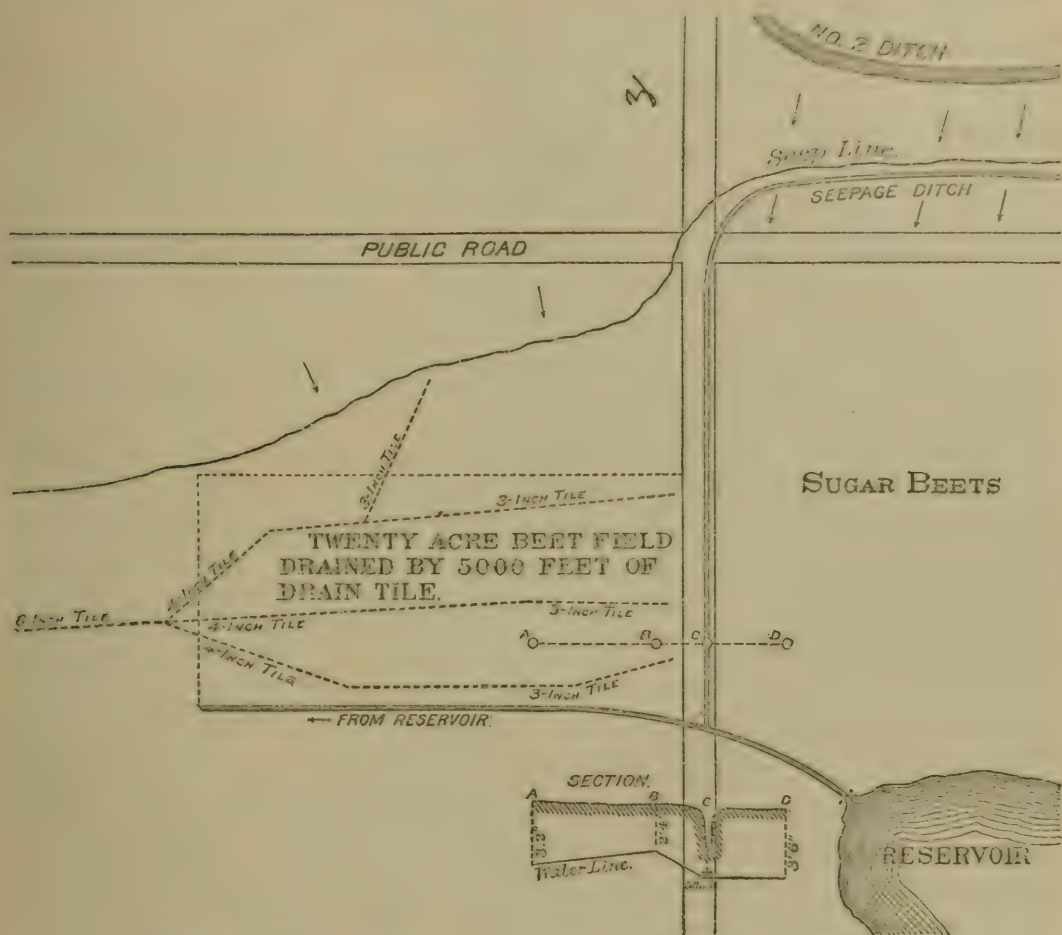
Drains and systems of location on farms northwest of Greeley, Colo.
